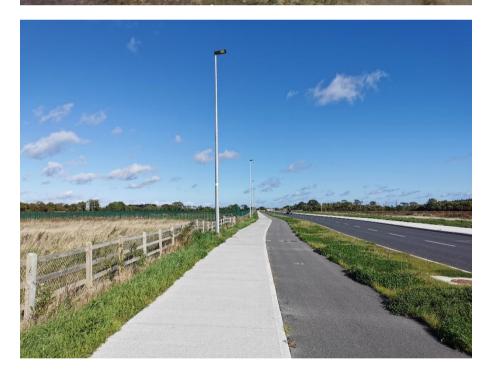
Beaverstown 4.2-3 (DU012-066-7 site of excavations
